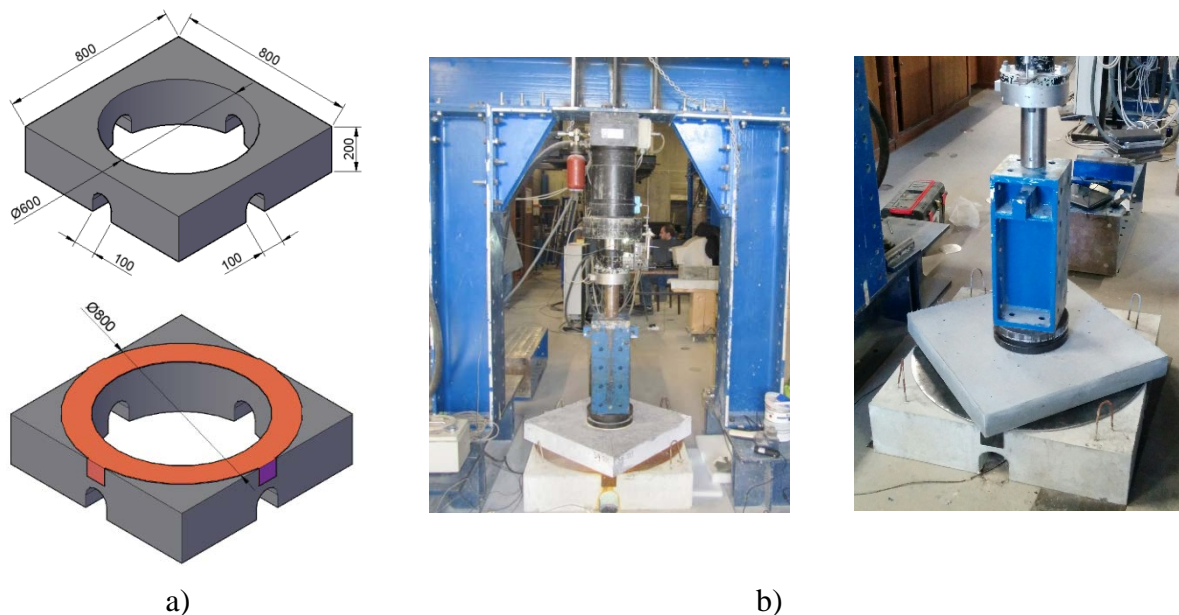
a) concrete base and steel support; b) testing frame, actuator and specimen.
